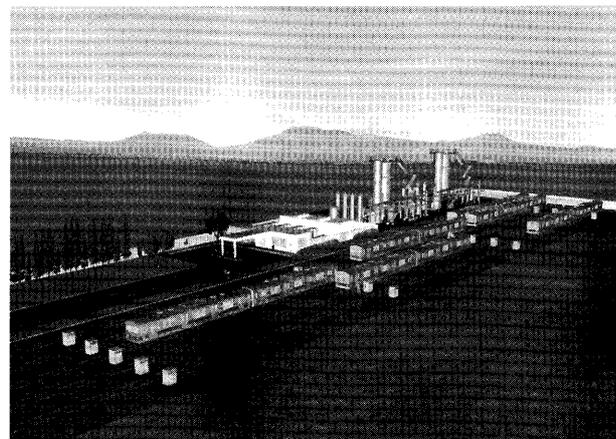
Illustration of a test plan of a railway hydrogen station.
